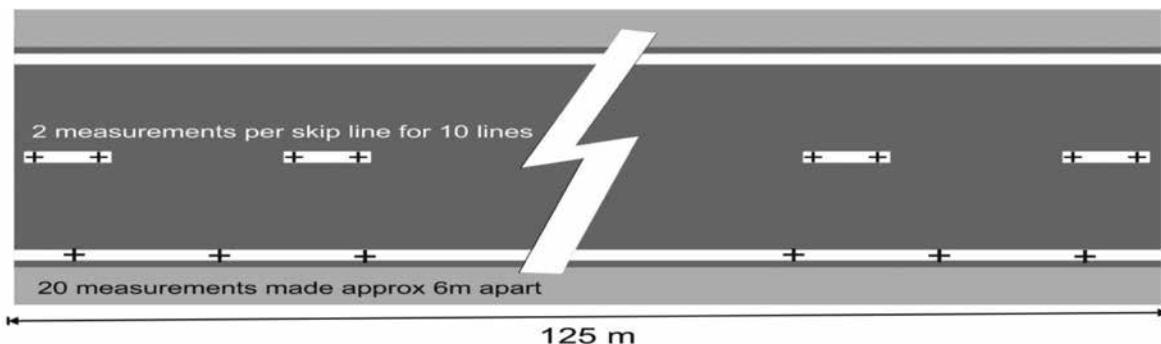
Typical Evaluation of Pavement Marking for Distance Less than 3 km
